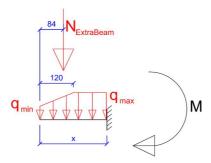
Sketch of the loading with only one beam acting on the cantilever (annotations in cm)
